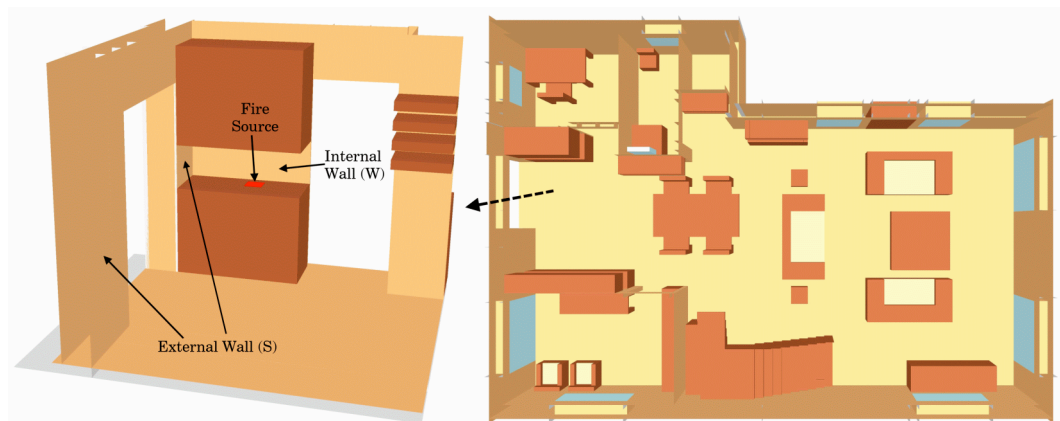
Top section of the ground floor of the simulated building (right) and detail of the kitchen area (left).
